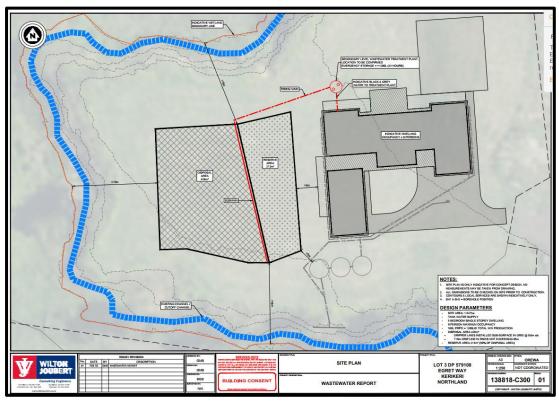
Wastewater Site Plan. Source: WJ Wastewater Report.
